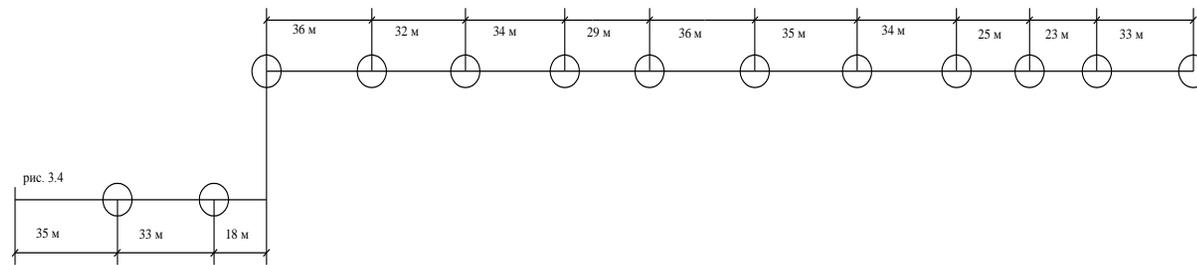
Schematic layout of lighting towers in Ul. Mitskevicha (from the intersection with Ul. Lomonosova to the intersection with Ul. Yubileynaya), City of Novogradok (layout – one-sided, luminaire installation altitude – 8.5 m)
